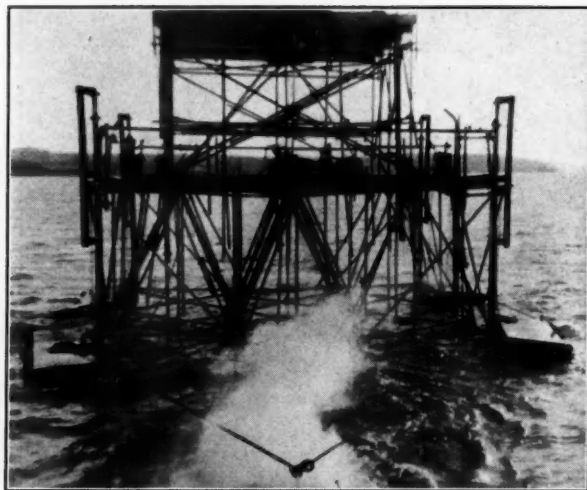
Tubular scaffolding boring tower being towed into position by launch. Boring equipment is lashed to top platform.
